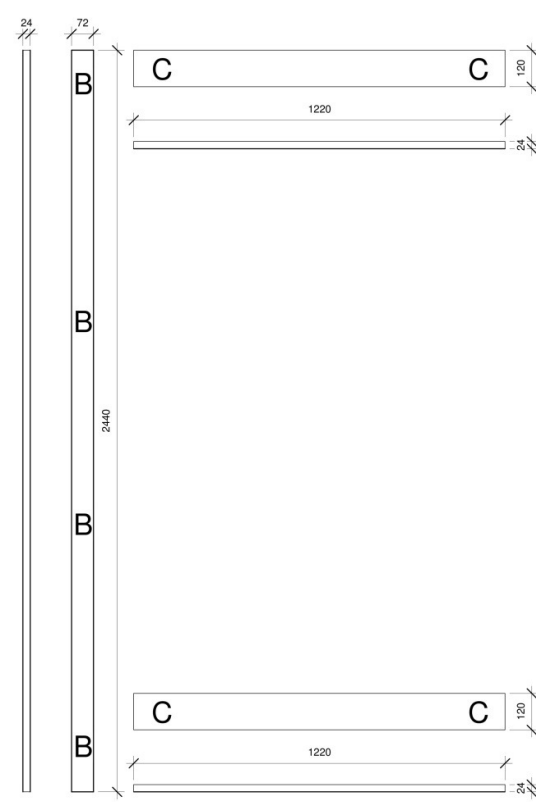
Stud/Ribs (B) and Top cap and footing (C)
